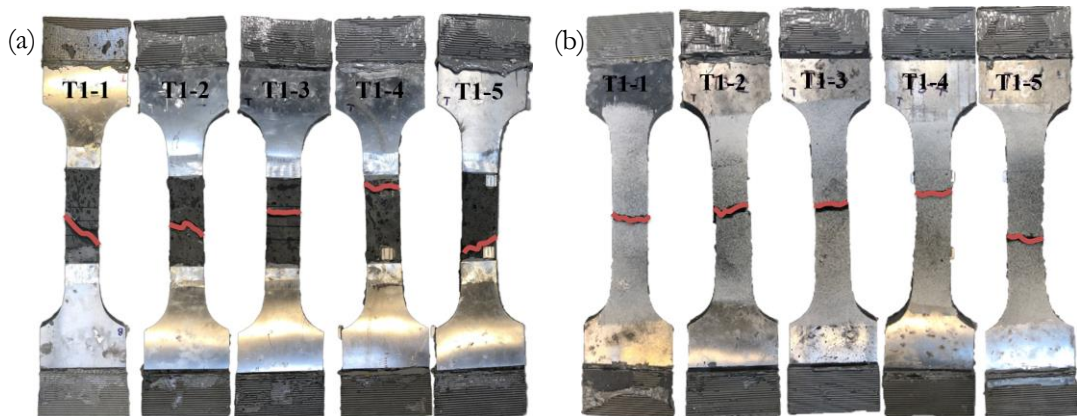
Location of discrete softening cracks of all DTT specimens (marked by red lines): (a) casting surface; (b) sheathed surface
